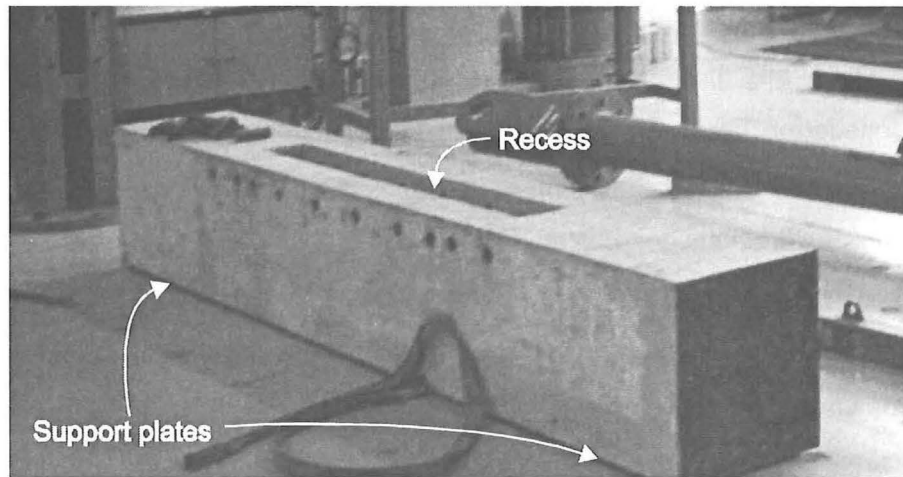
Unit 1 foundation beam showing cast in recess.
